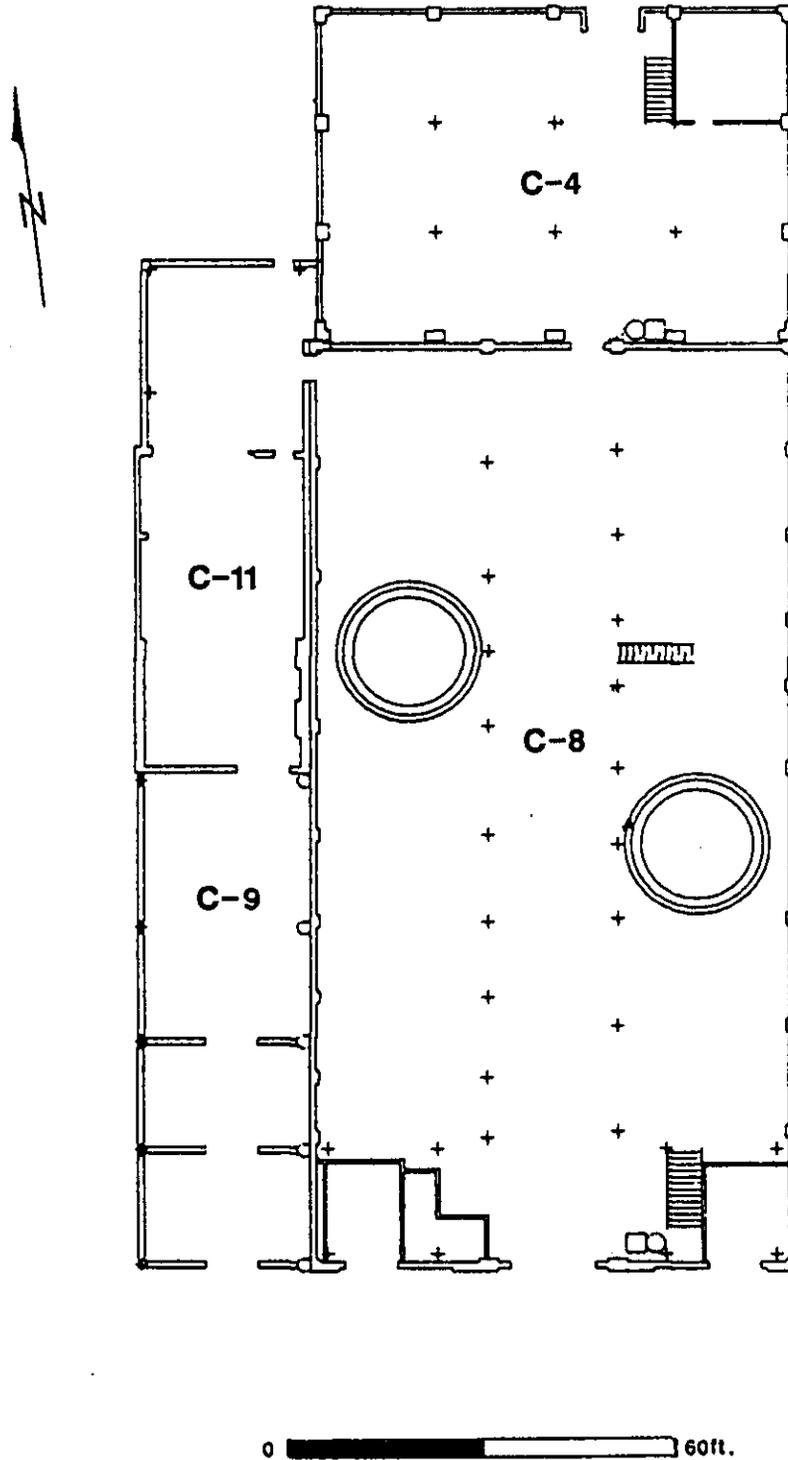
FIRST FLOOR PLANS OF C-4, C-8, C-9, AND C-11
